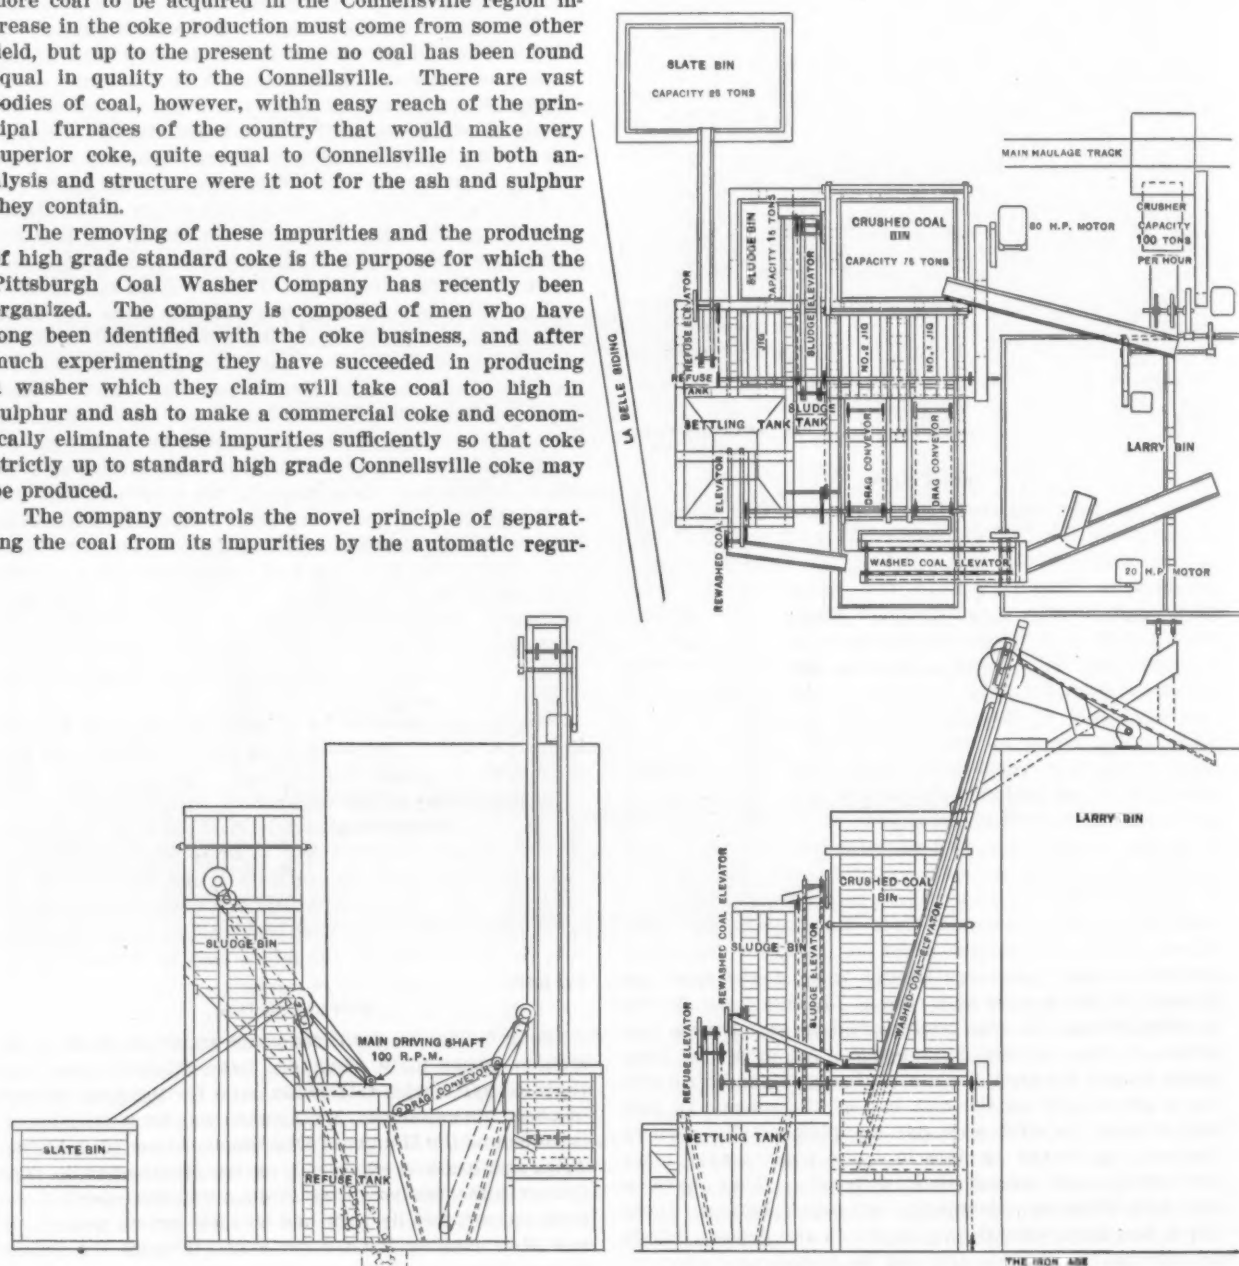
Two Side Elevations and Plan of a Complete Coal Washing Equipment.
